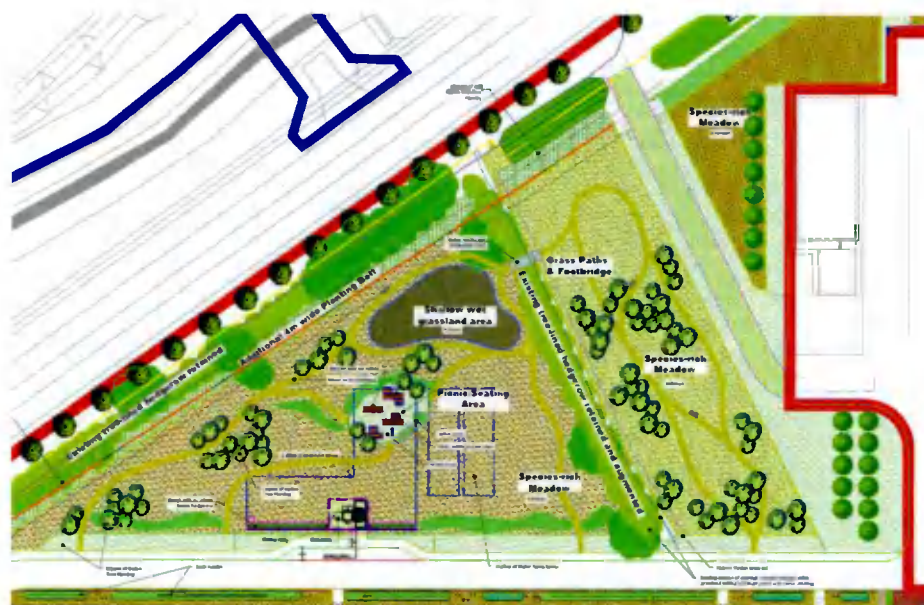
Revised Meadow Grassland Area with Water Treatment Plant Underground
